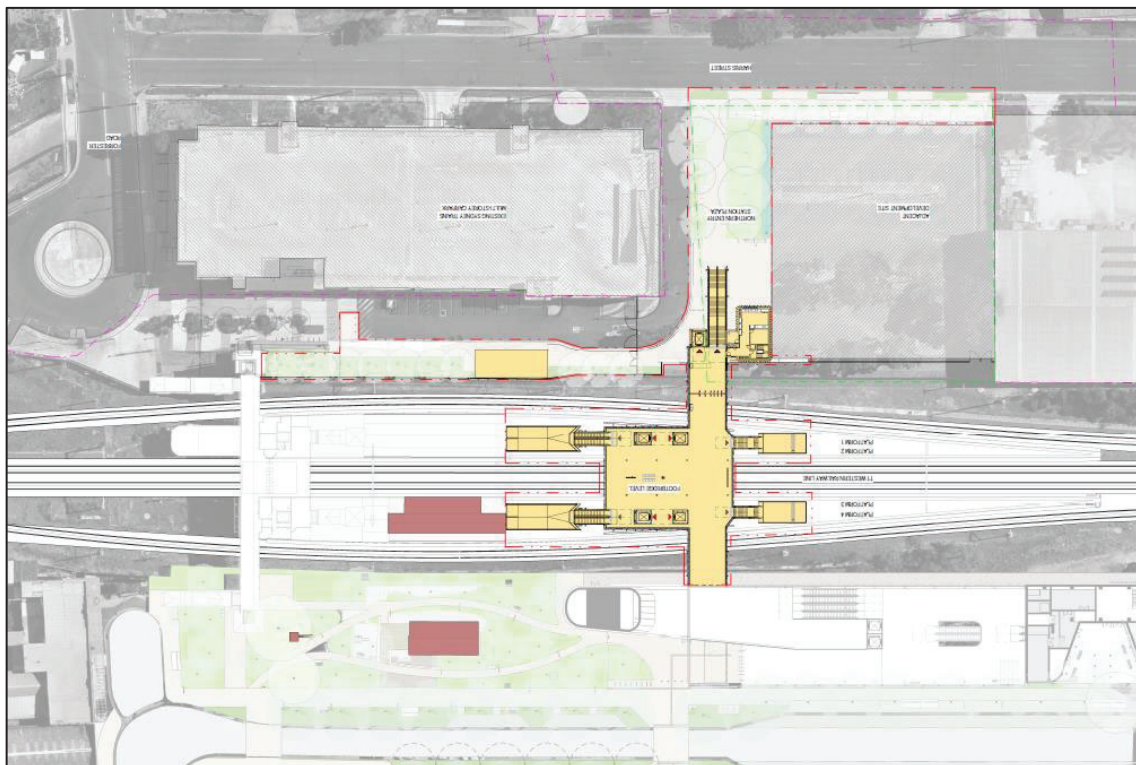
Indicative layout of the new Intermodal Footbridge St Marys indicative proposed footbridge construction
